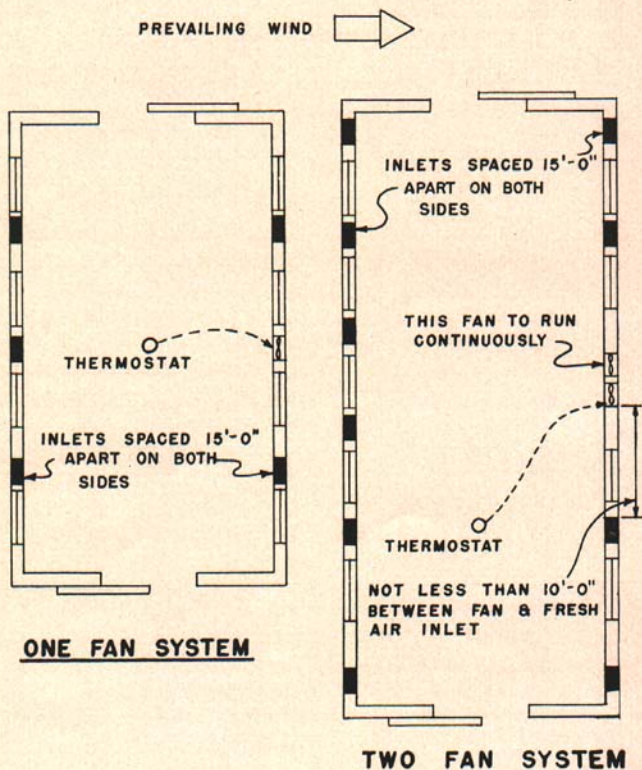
Floor plans showing the one-fan ventilating system adequate for a small barn, and the two-fan system necessary in a larger barn. Note location of the controls in each system, and how the fans are paired for the large structure.
